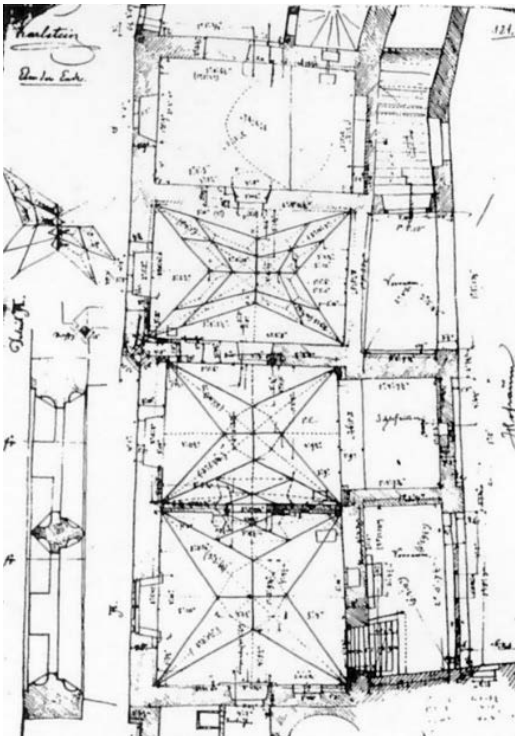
Josef Mocker, drawings - Karlstein, 1886
